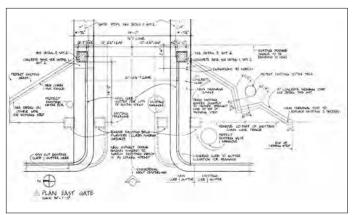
Detail of site plan for widening of the east gates at Oakwood Cemetery, 1980 (City of Austin)
